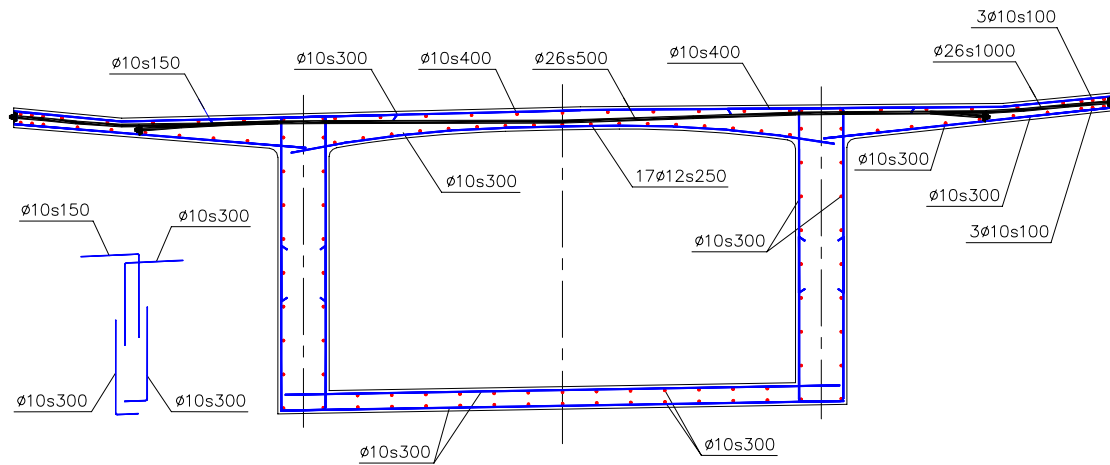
Cross-section and reinforcement layout in the critical section (29.5 m from the west pier, in the west 50 m cantilever). Modified from Plos *et al.*⁷.
